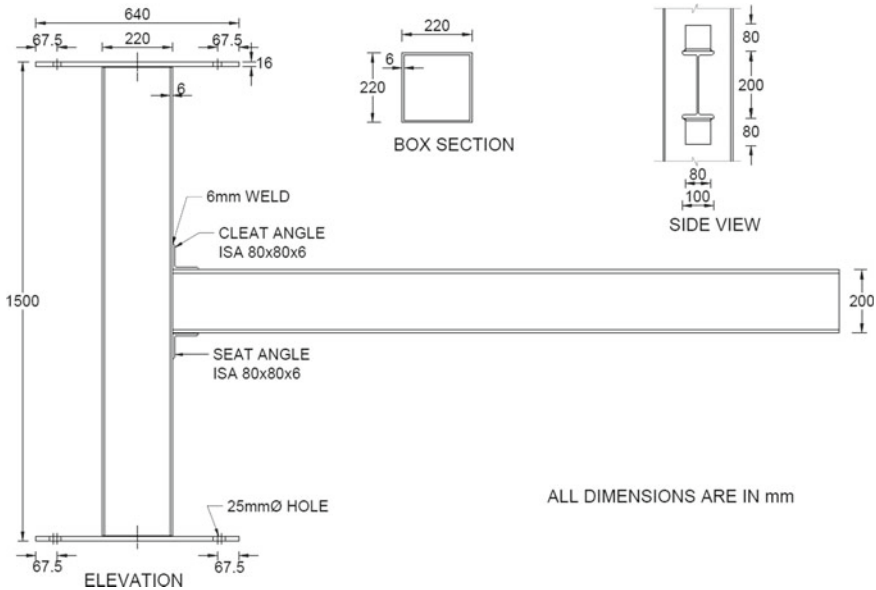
Schematic diagram showing welded beam-to-column joint
